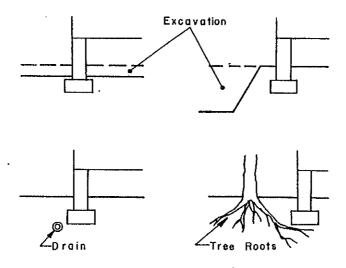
CAUSES OF GROUND SHRINKAGE UNDER FOUNDATIONS
